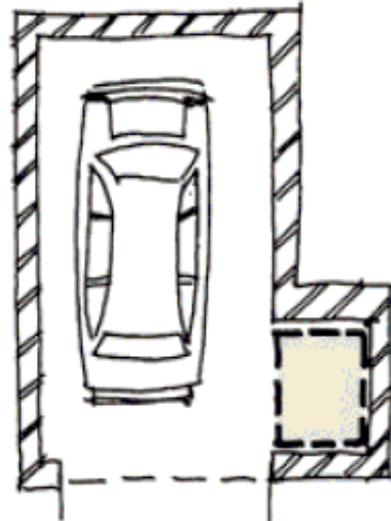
Sufficient storage should be provided for each dwelling to ensure that parking spaces are not used for storage.
